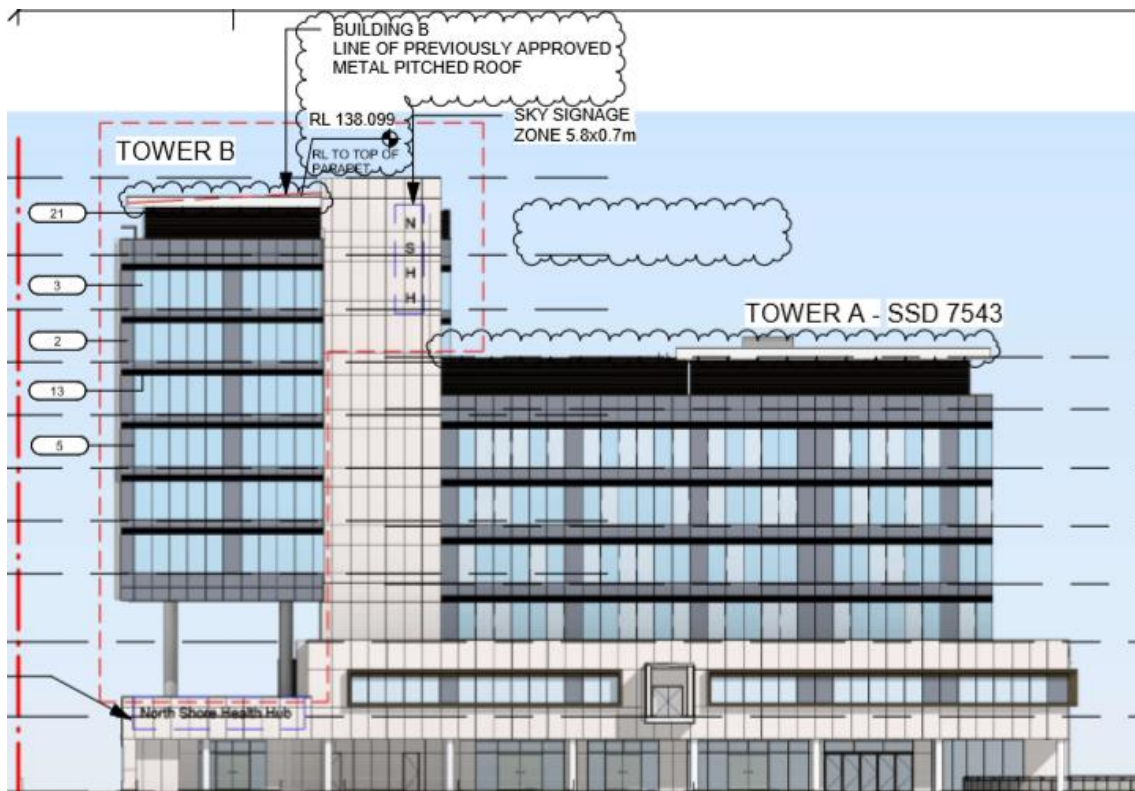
Proposed changes to Tower B - Western Elevation (SSD 8499 and SSD 8894) (Source: Billard Leece Partnership)
